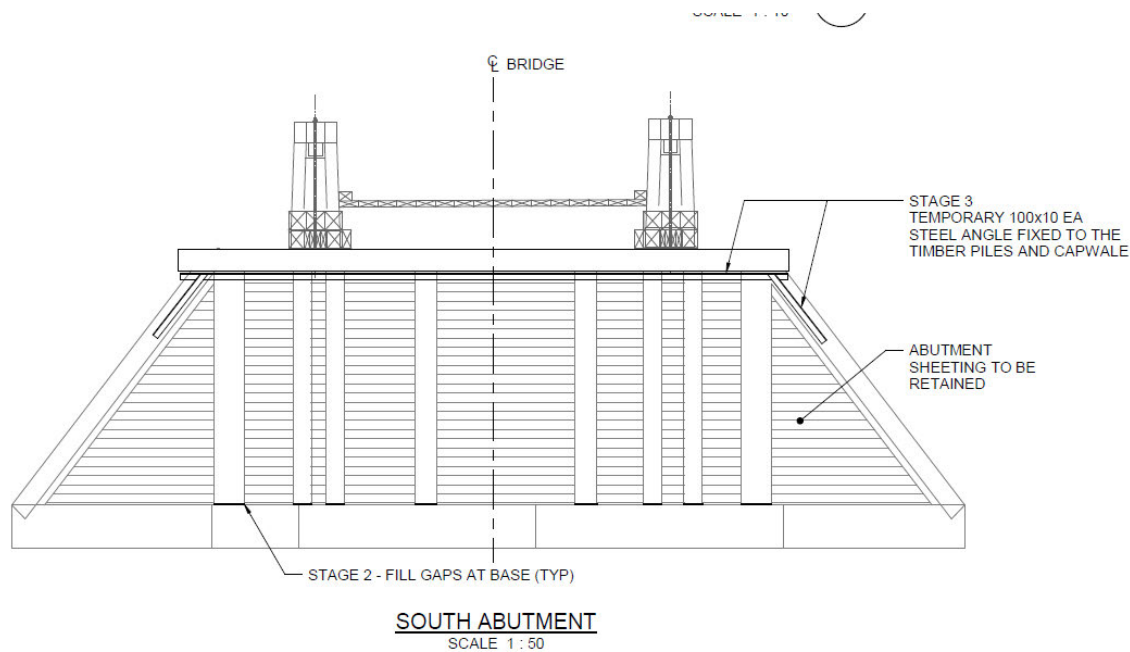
South abutment steel framing installation location Source (: 100% detailed design drawing number 520212TP-AURC-B00390-ST-DRG-000013)
